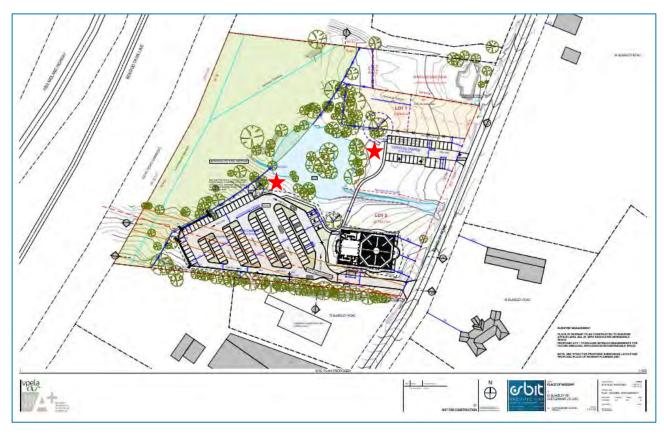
Potential Locations of Raingardens to meet Best Practice (shown as red stars)
